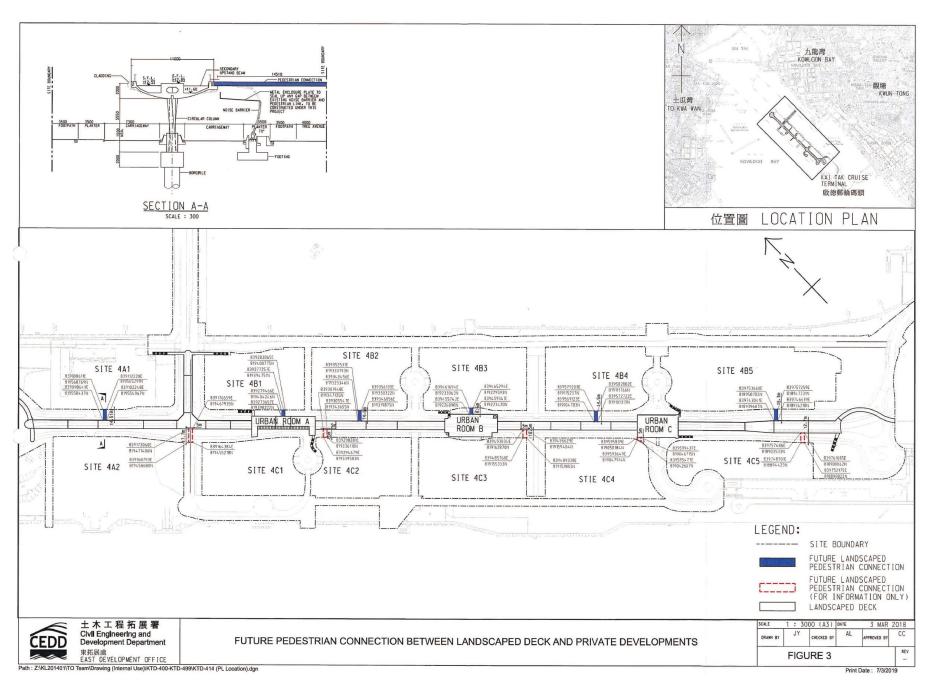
Future Pedestrian Connection Between Landscaped Deck And Private Developments
